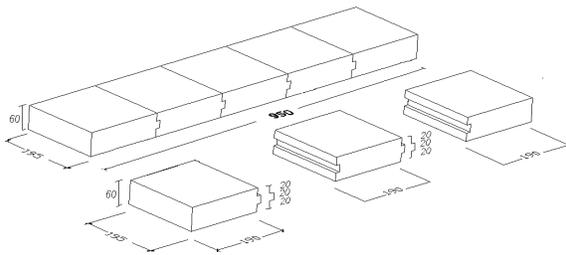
Detailed drawing of specimens for out-of-plane loading tests
